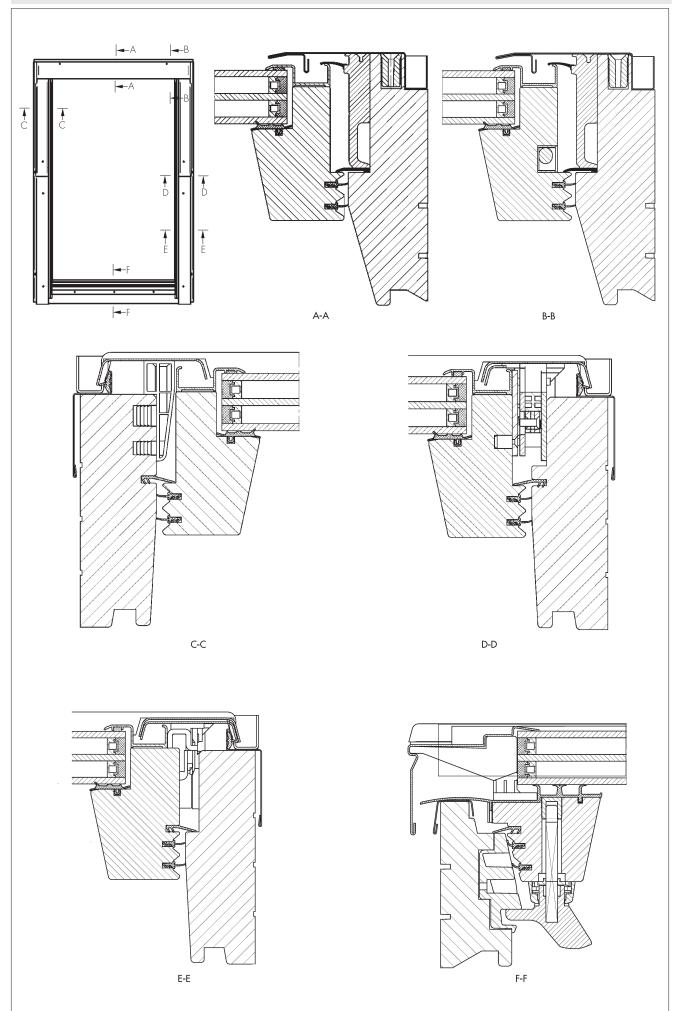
FTT U6 Centre Pivot Roof Window cross-sections
